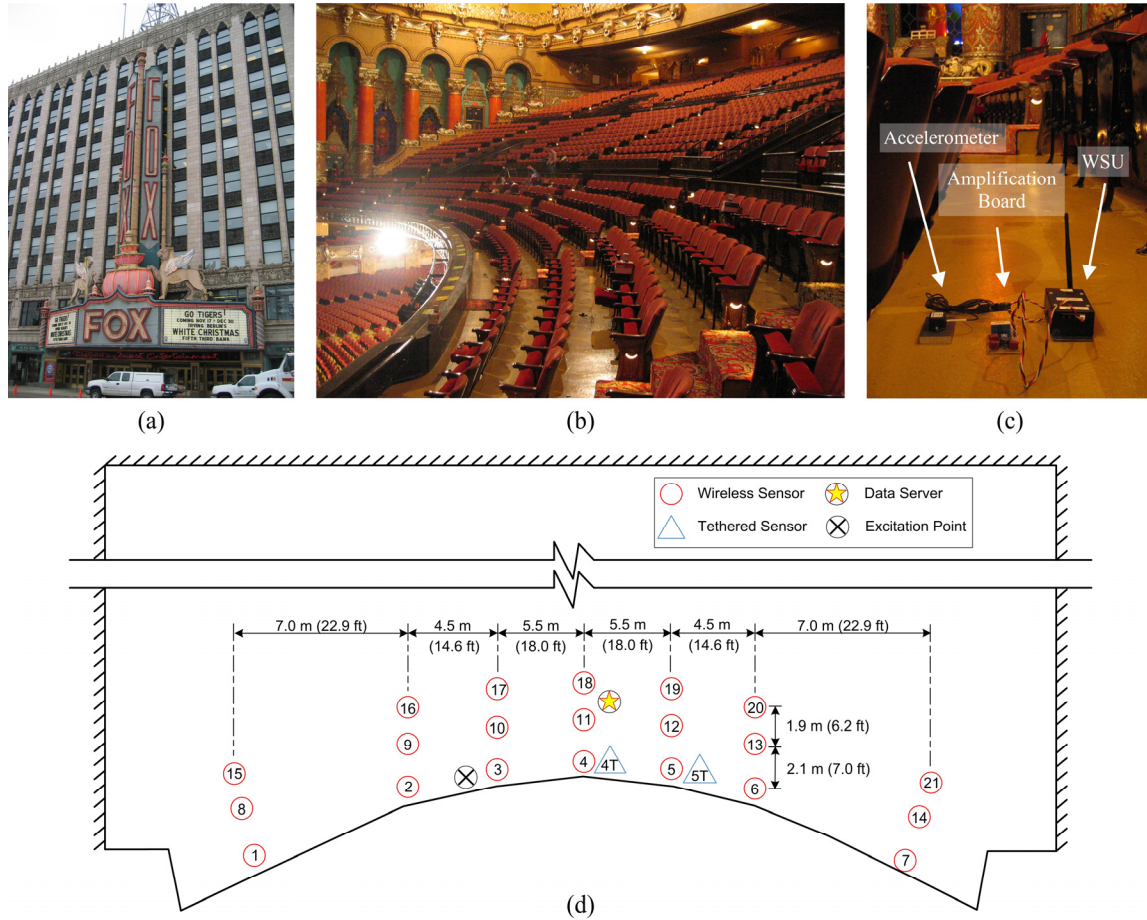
Wirelessly instrumented theater balcony: (a) theatre, (b) main balcony, (c) a typical wireless sensor layout, and (d) location of wireless and tethered accelerometers (not drawn to scale).
